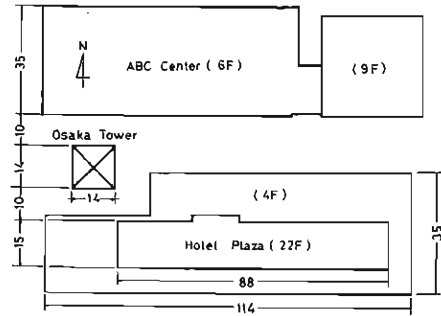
Detailed plan of the measurement site. (unit in meters)
